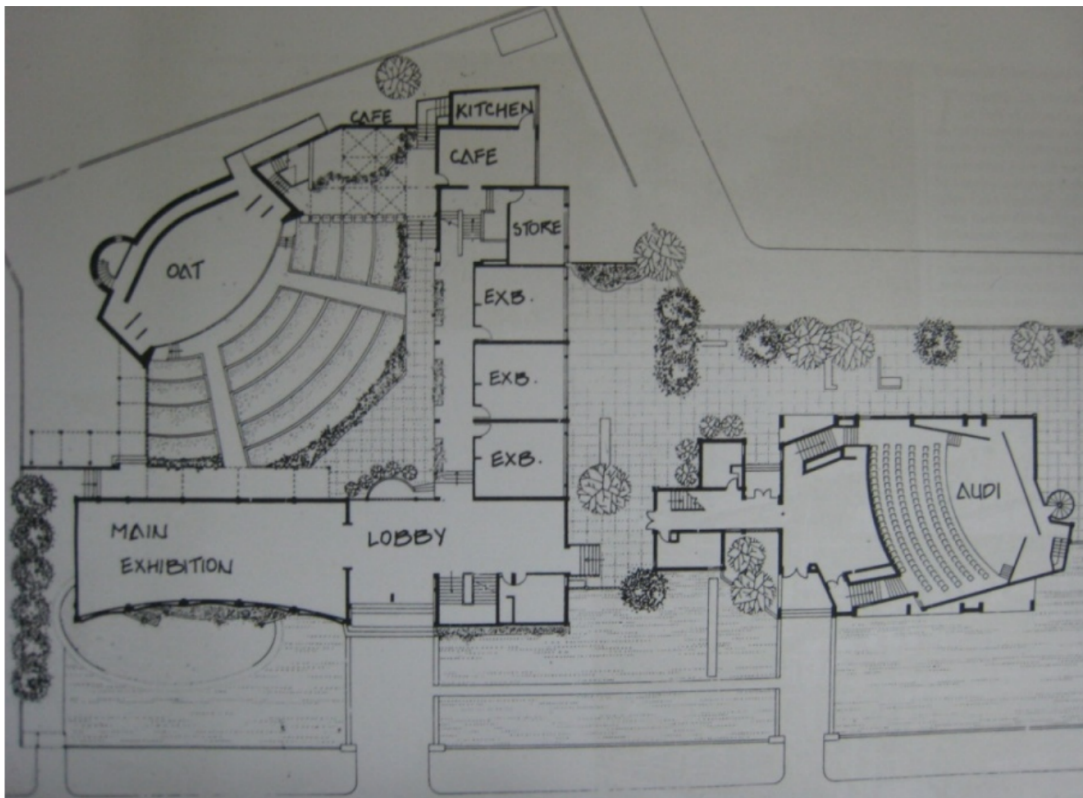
Sketch of Site Plan :Triveni Kala Sangam
